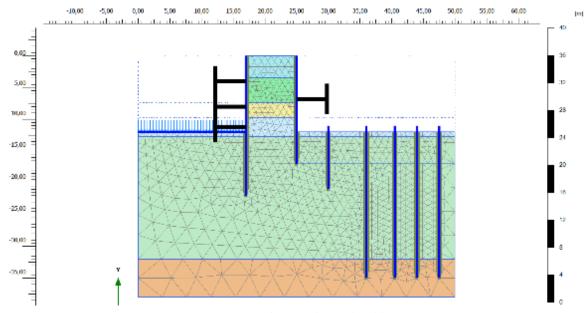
Stage 3 – Excavation to -12.00 m with groundwater level lowering to -12.50 m
